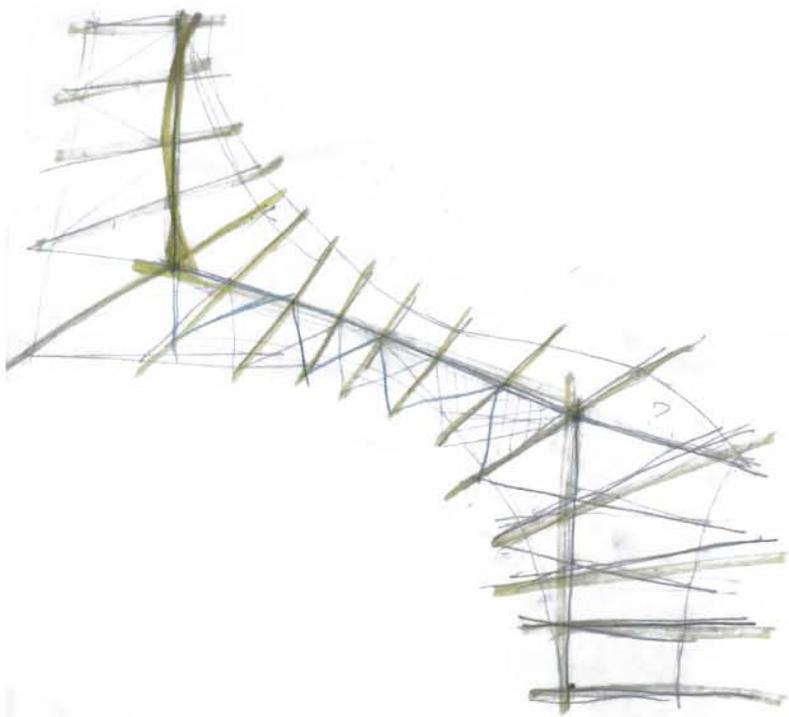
Deriving a structural logic. Trapezium shapes for main supporting structure proved to be successful at creating the desired shape on plan between the two glasshouse facilities. September 2008
